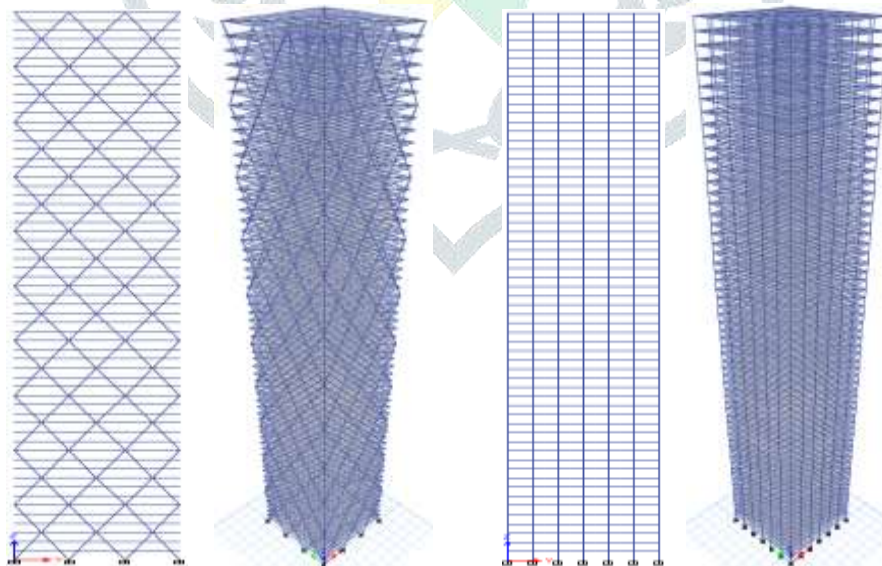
Elevation and 3D of 60 storey diagrid and conventional building
